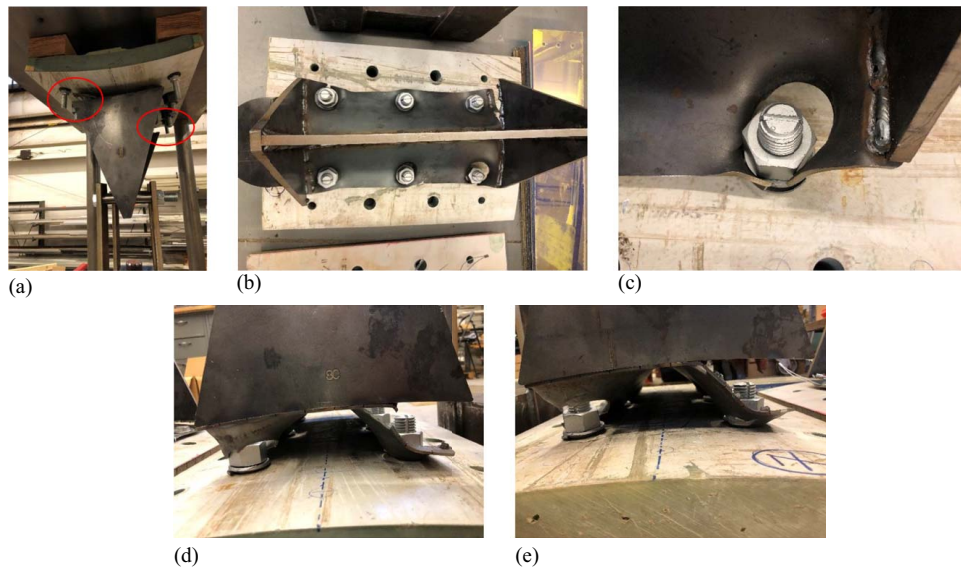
Failure of Type III blind bolt pull-out specimen: (a) welding failure on the same side of the universal connector; and (b–e) buckling and welding fracture of the base plate.
